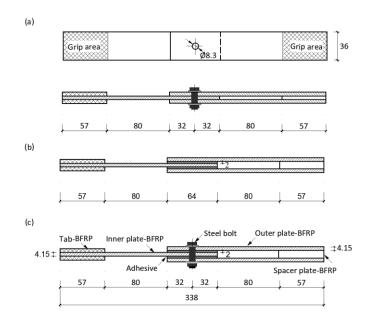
Joint dimensions: (a) bolted joint; (b) bonded joint; (c) hybrid joint (dimensions in (mm)).
